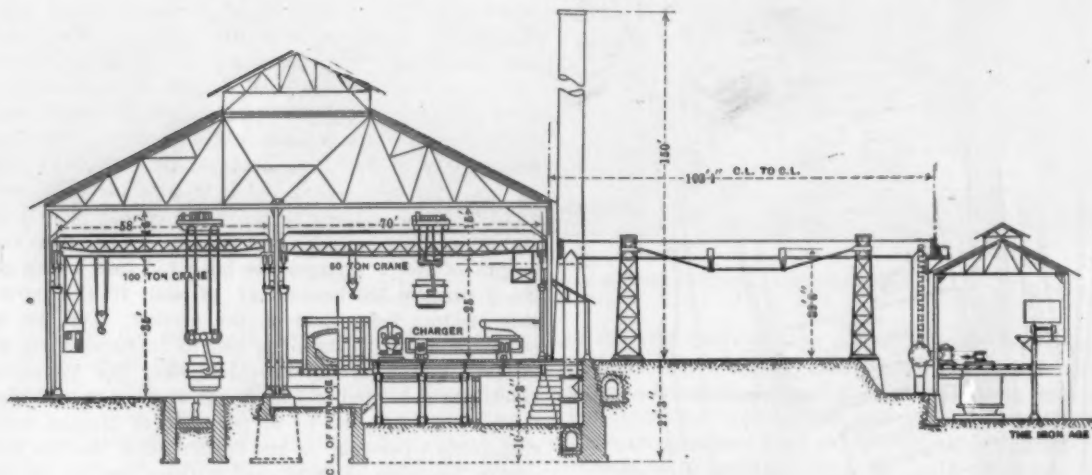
Cross Section through Open Hearth Building, Stock Yard and Producer House.
